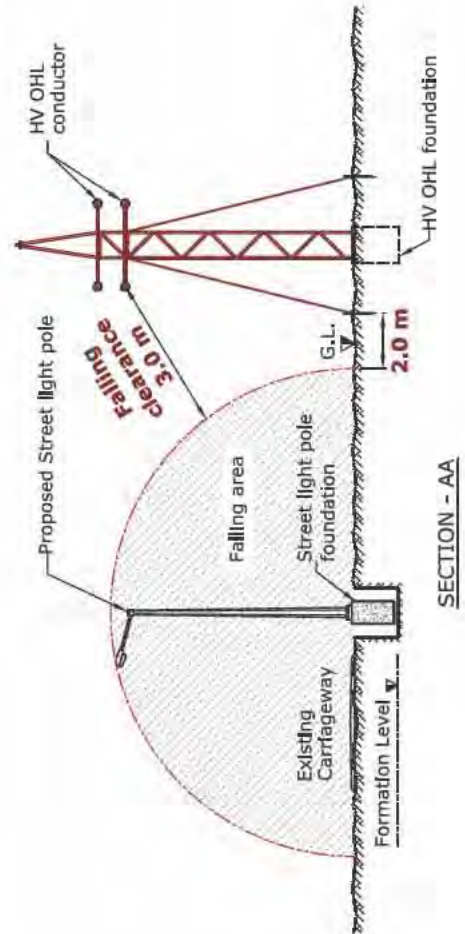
FALLING CLEARANCE DETAILS BETWEEN PROPOSED STREET LIGHT AND EXISTING HV OHL (6.6/11/33 kV)
